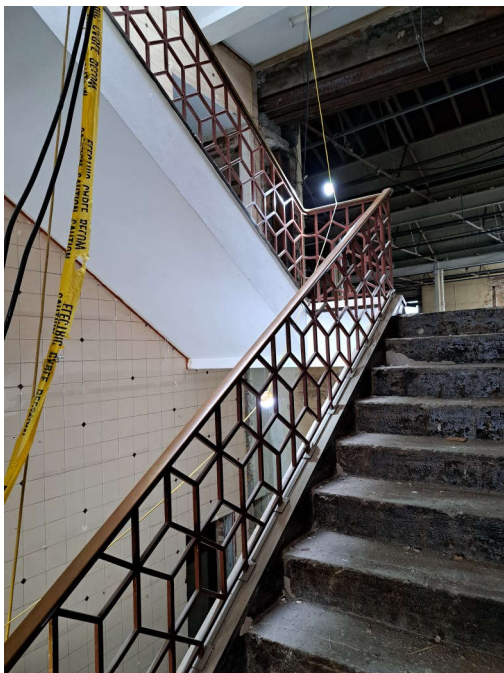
1950s/1960s baluster and handrail in stairway of Building 4. No scale
